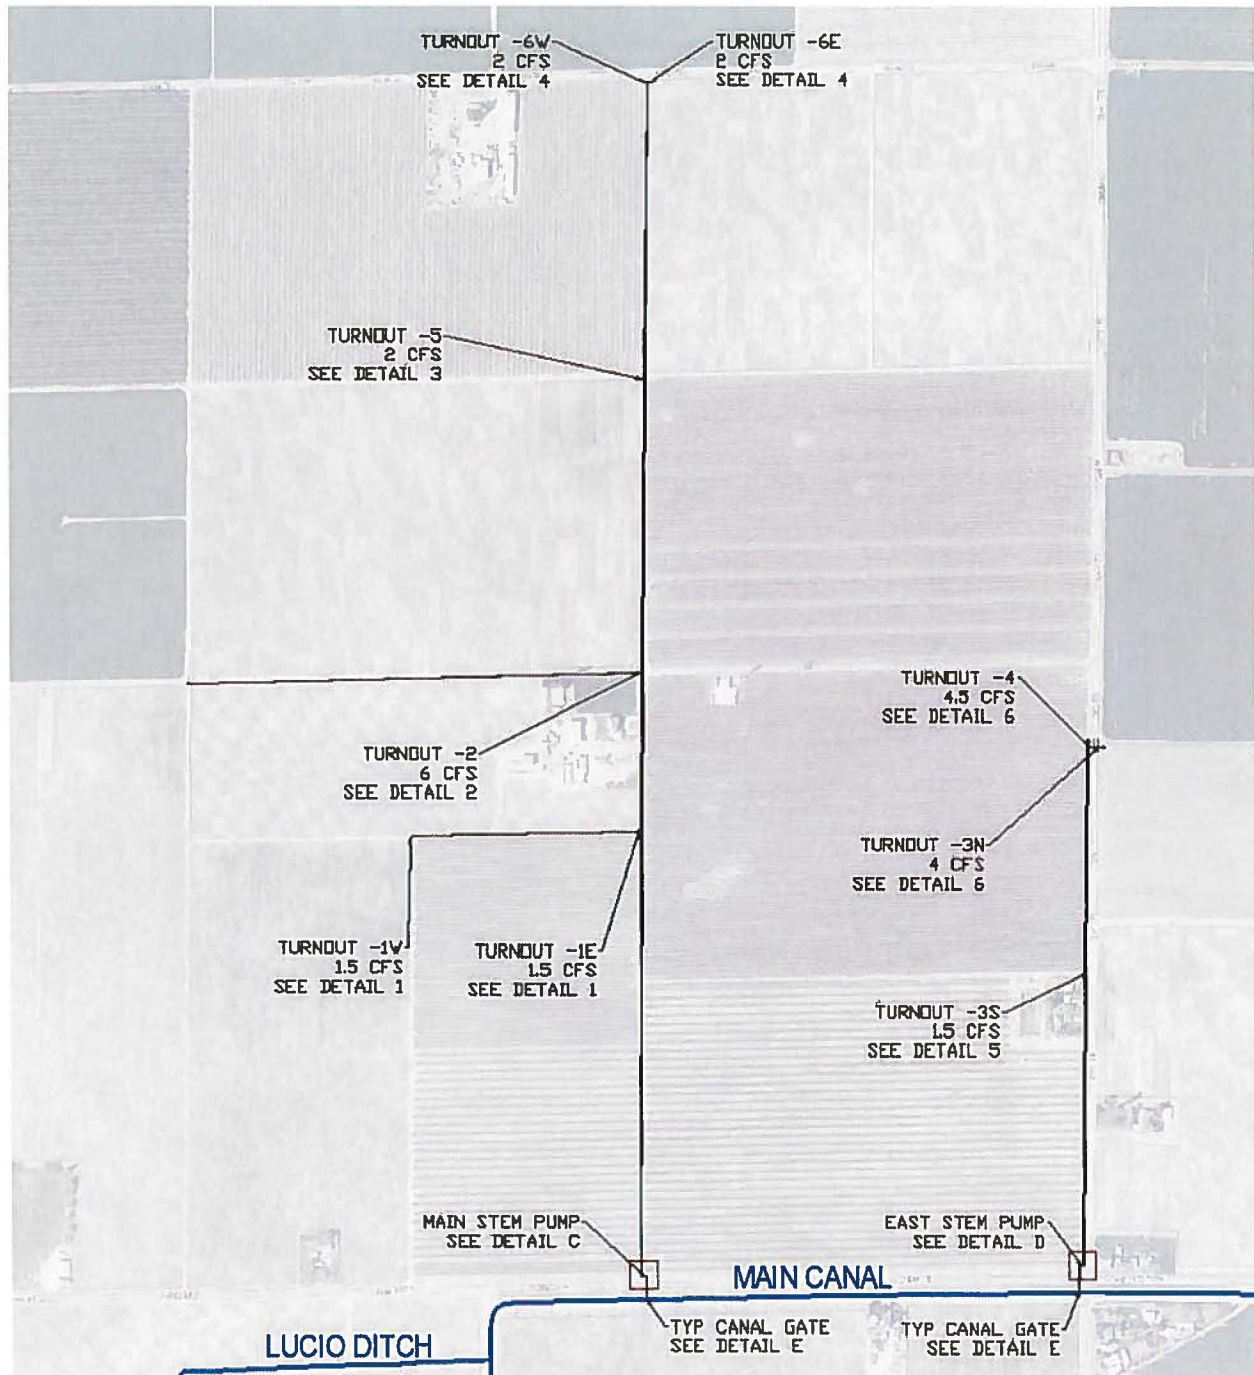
Area 18 Pipeline Design Layout (from Draft Preliminary Design Plans). See Design Plans in Appendix B for additional detail.
